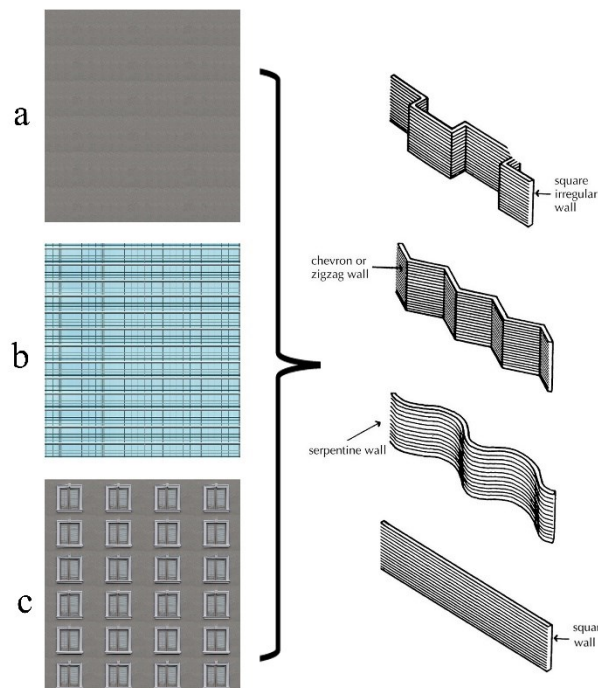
17: Type of wall design (opaque wall, curtain walls and window-walls)
